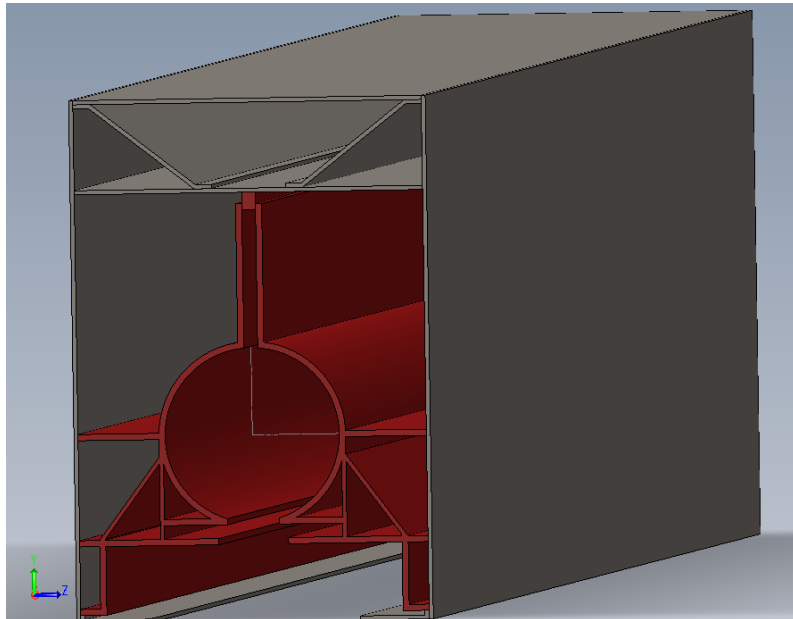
Guideway cross-section showing steel beam structure (gray) and aluminum extrusion segment (red).
